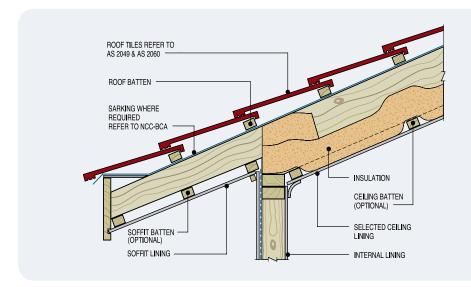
Cathedral Roof/Ceiling Construction. Section through roof
